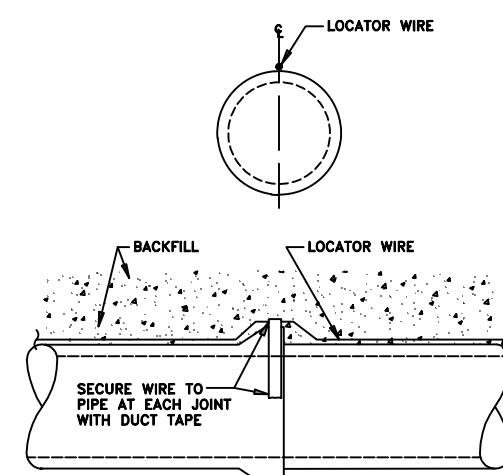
SEWER TRACE WIRE - SAMPLE PLAN
